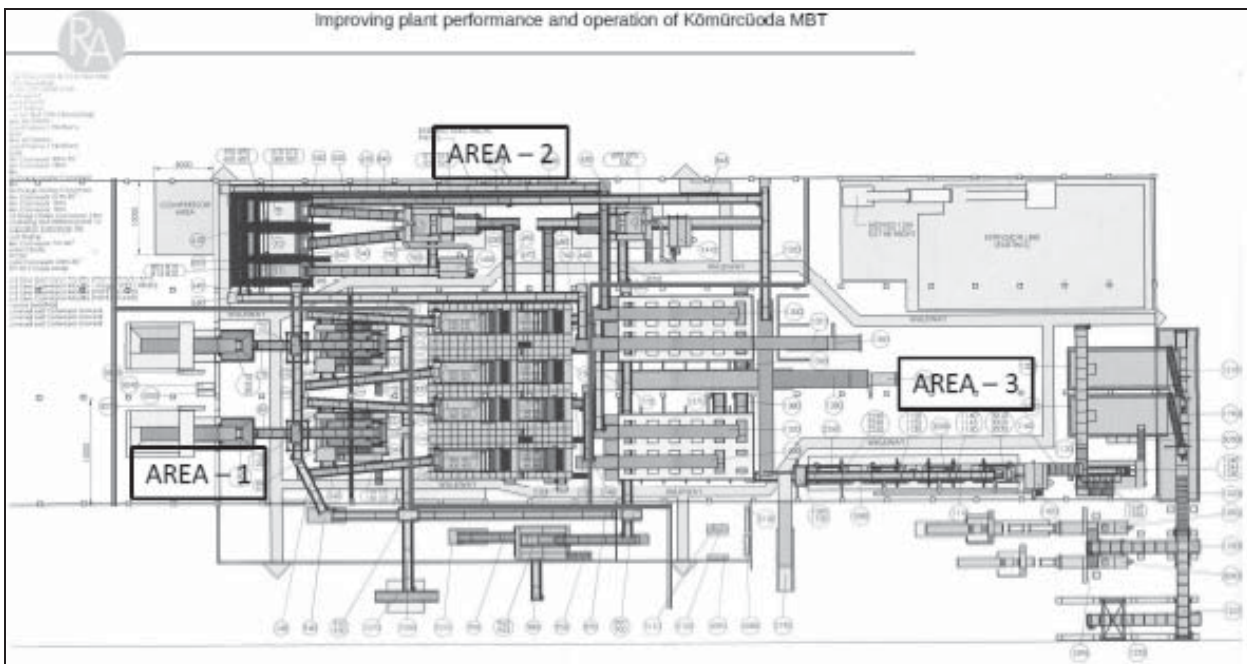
Former Plant Layout of K m rc oda MBT – Pre-MT plant
